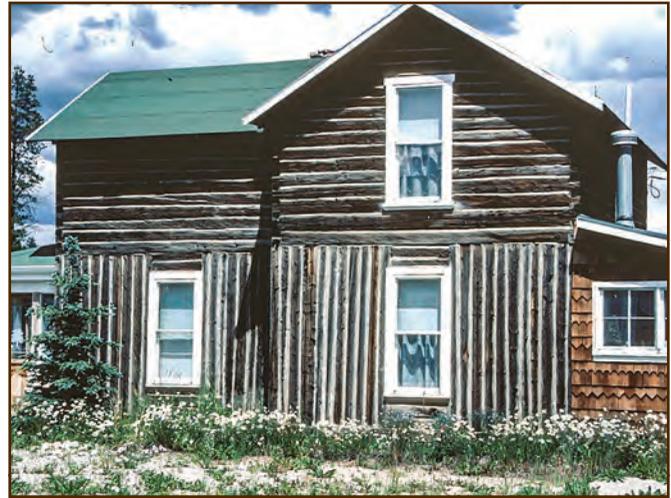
The builders constructed the first floor of this home in Frisco, CO, using stockade style log construction, except at the windows, where they stacked the logs horizontally.
